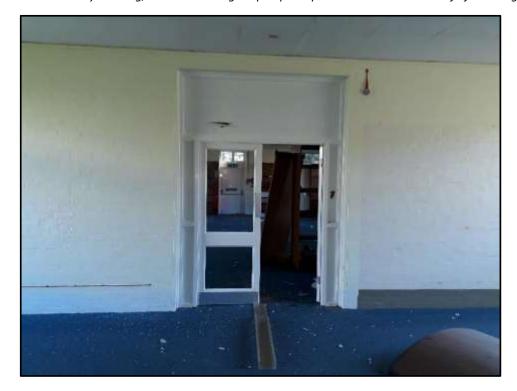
Library building, south west range. Doors lead into a later addition added to the south east end of the south west range
